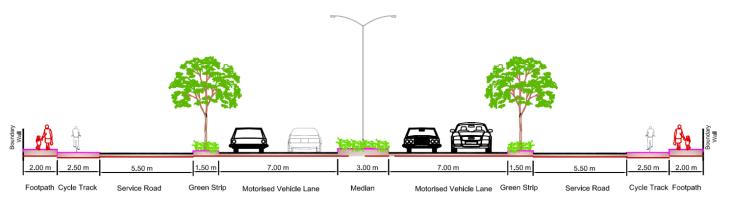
Typical cross sections of a 40 metre wide bypass road
